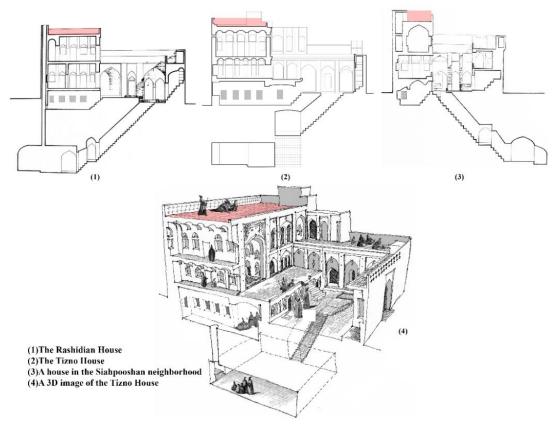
The Sixth Layer (Roof) (Source: Authors)
